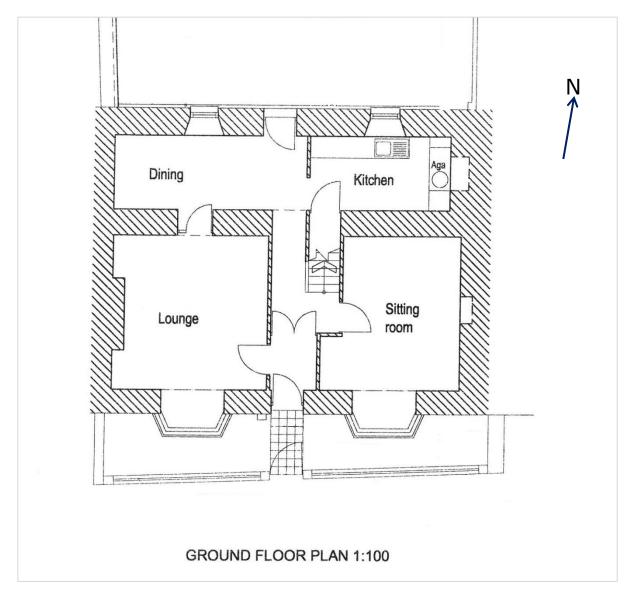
Plan of the ground floor layout of the Gwaunfa property. Plan supplied by Pembroke Design Ltd.
